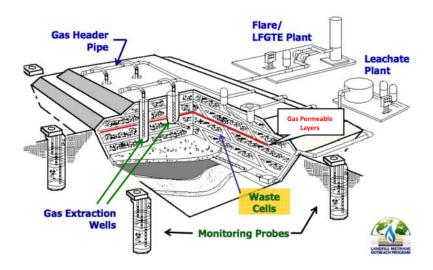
Landfill gas collection well with permeable layer installed as waste filling advances.
